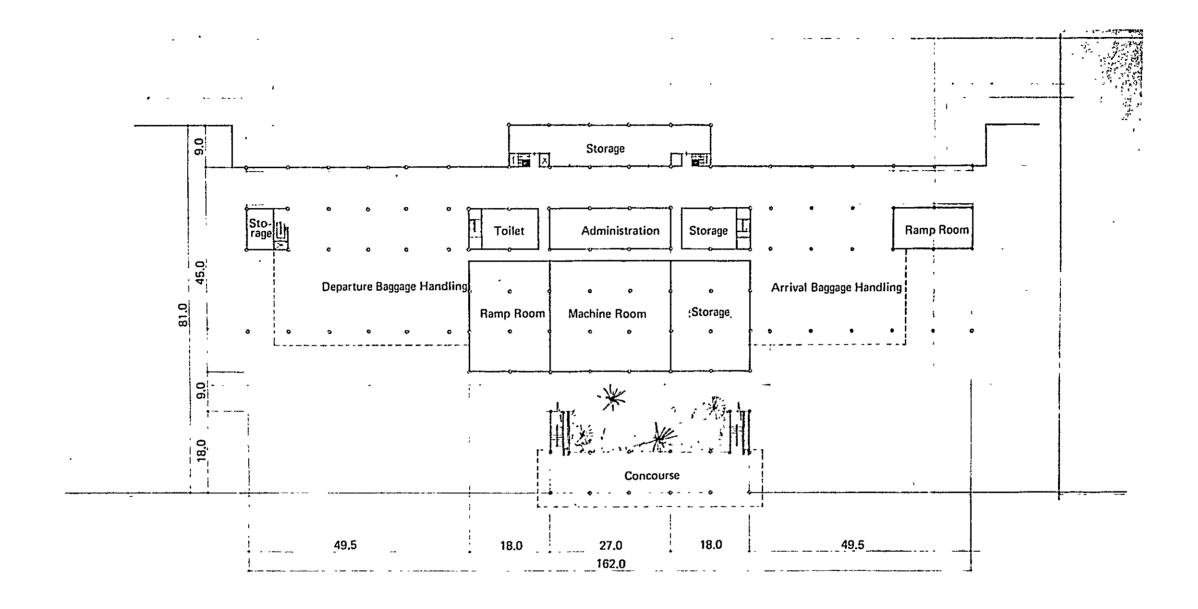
Proposed International Airport Terminal Building Basement Floor Plan
